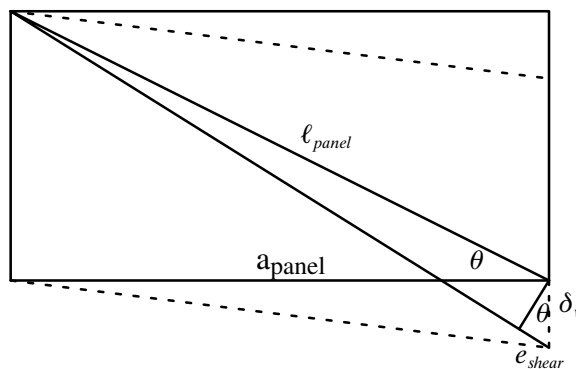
Deflected shape of a typical frame in a shear wall or diaphragm
